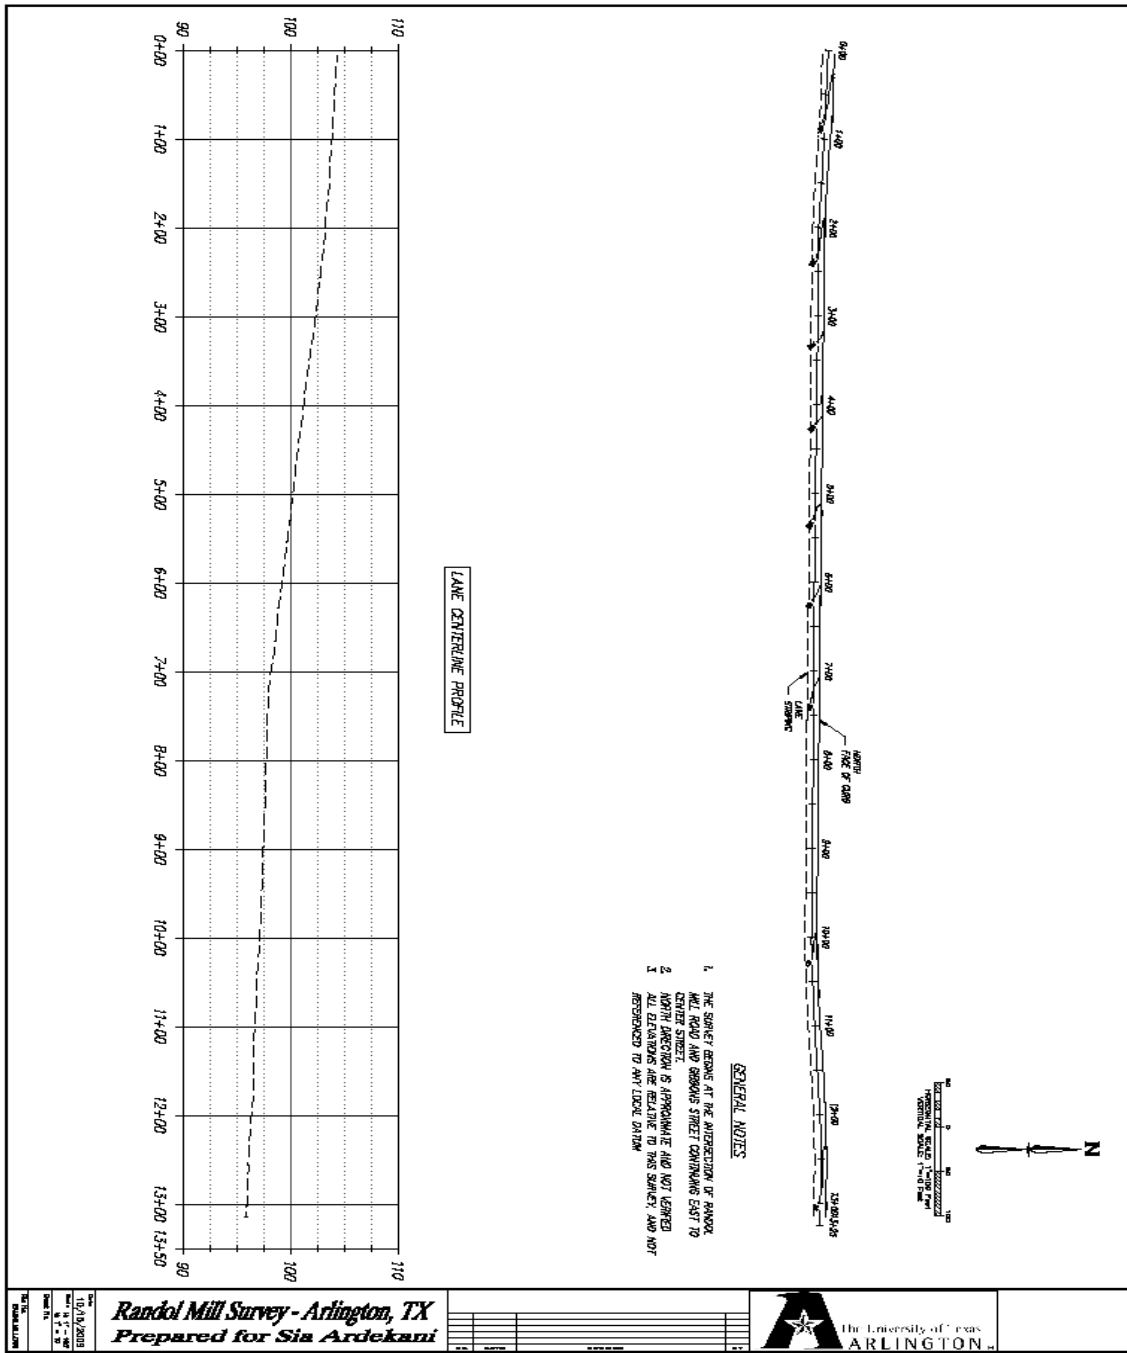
Longitudinal Grade for Randol Mill Road (AC) in Arlington, TX.
